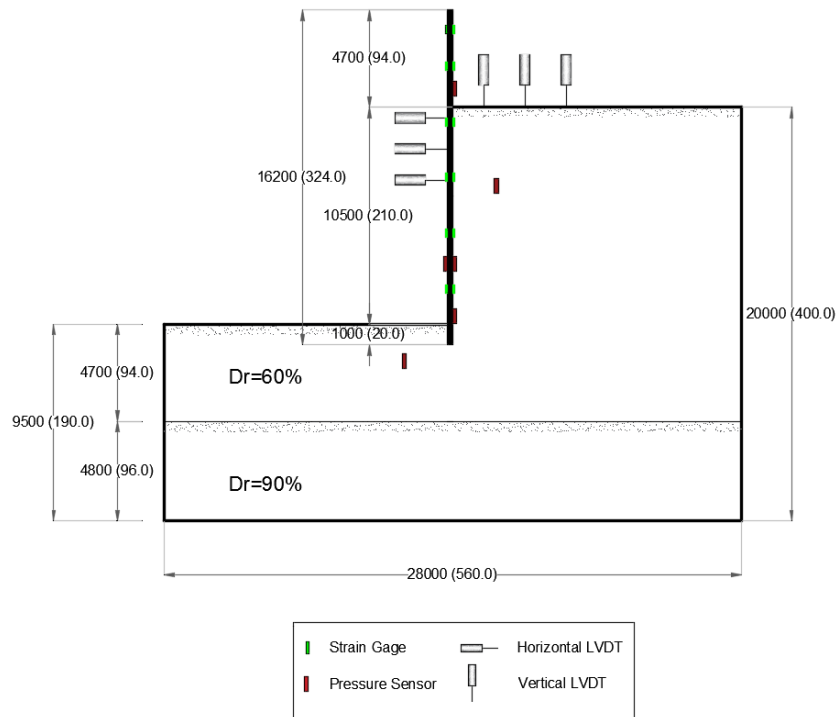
Cross section of the centrifuge model before sheet pile wall driving); the dimensions are provided in prototype-scale (and model-scale) in millimeters.
